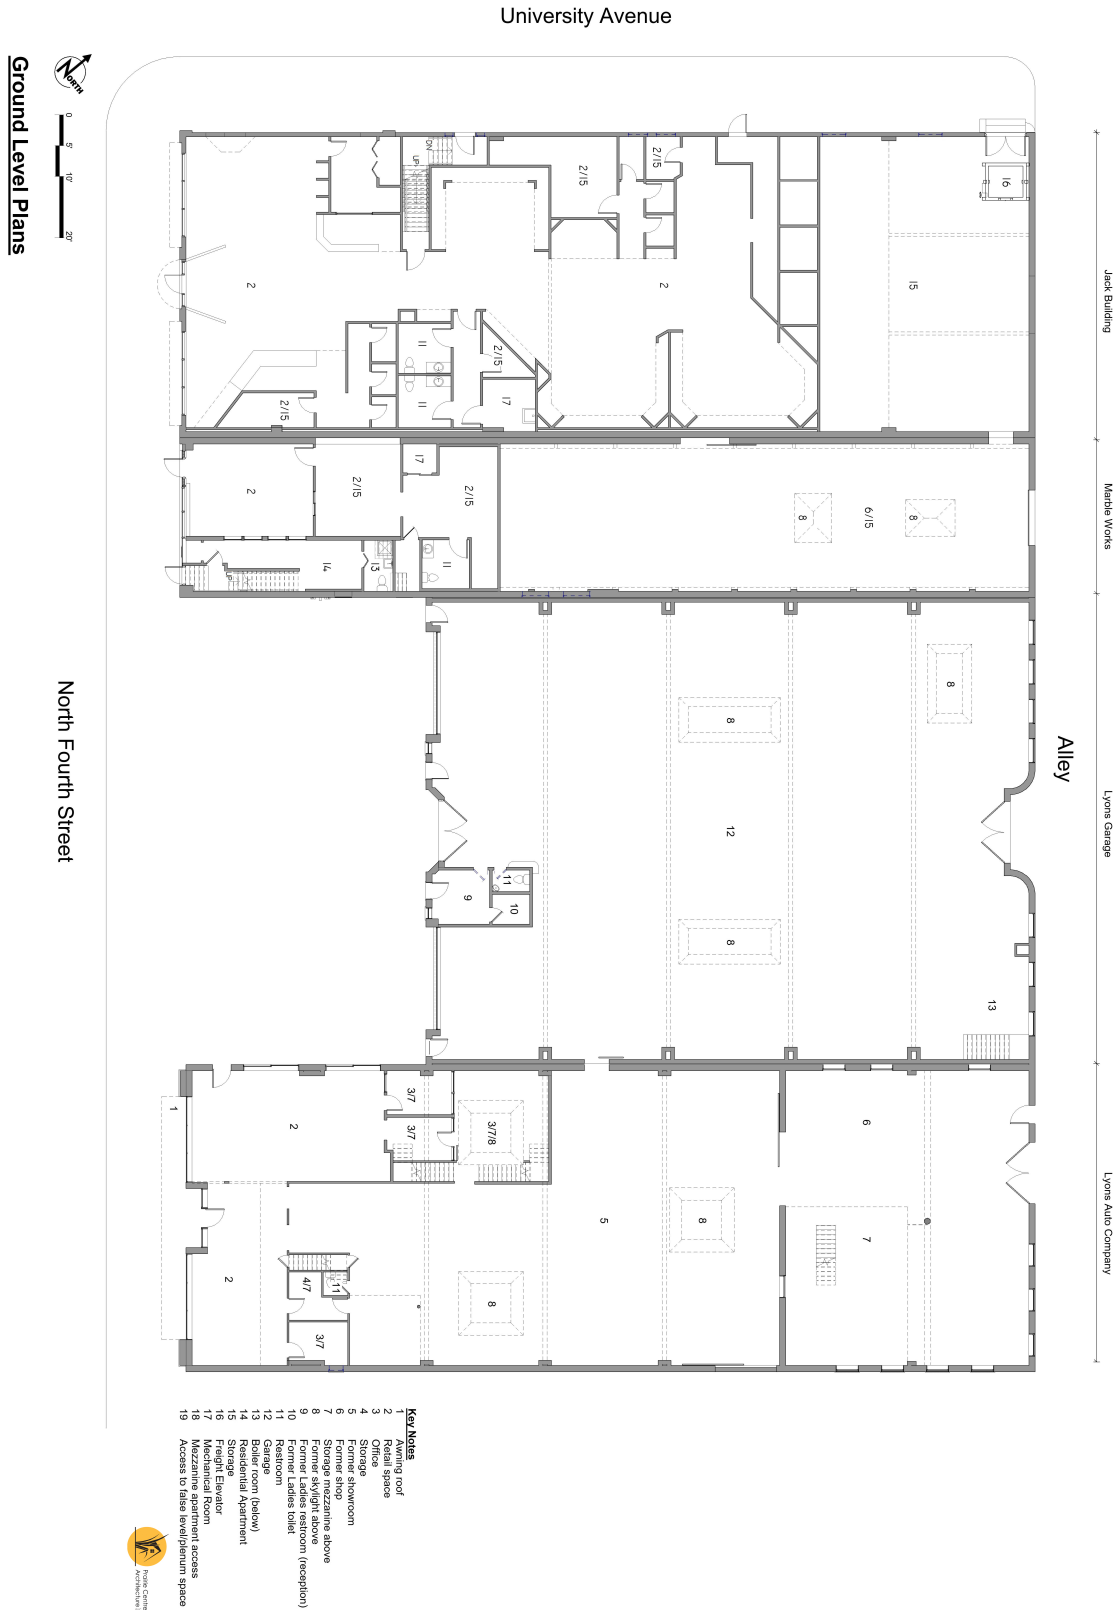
Ground floor plans (left –right) for Jack's Roller Rink, Marble Works, Lyons Garage and Lyons Auto Company with key notes, 2020. Source: Prairie Centre Architecture PLLC.
